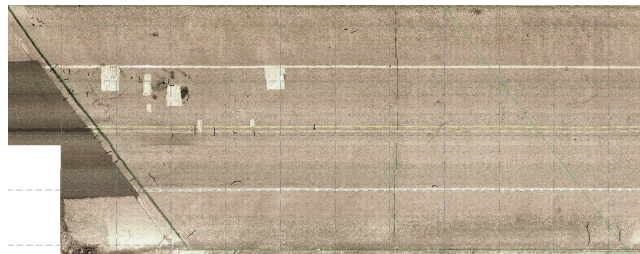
Existing Cracks on Bridge Deck No. 22451-Span 1
